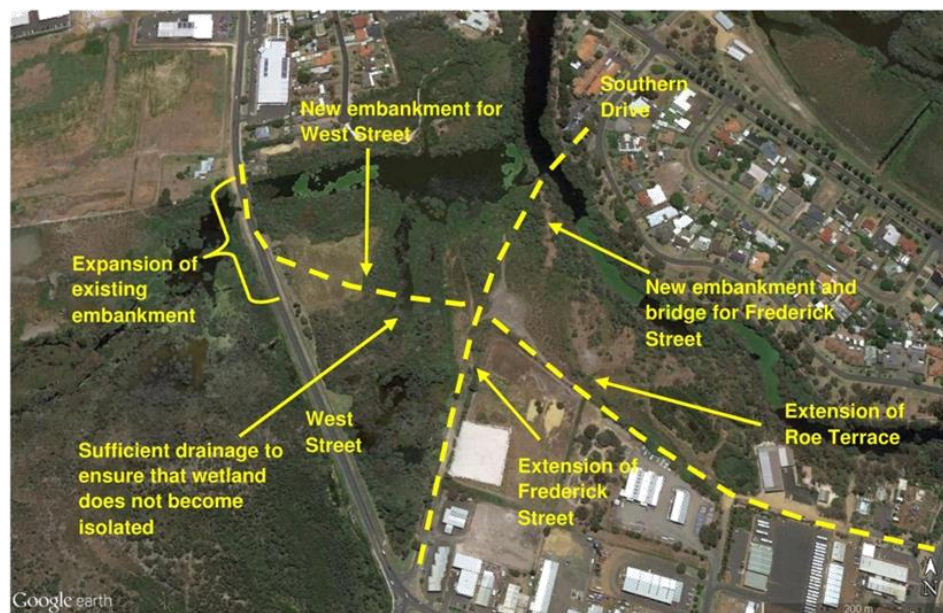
West Street and Frederick Street road crossings (imagery source: Google Earth Pro)
